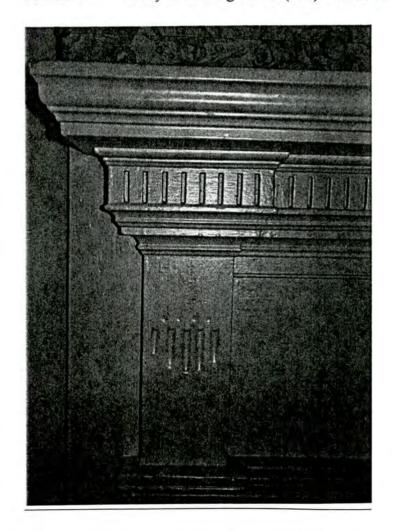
Henry L. Herring House - Federal-style upstairs west bedroom mantel
